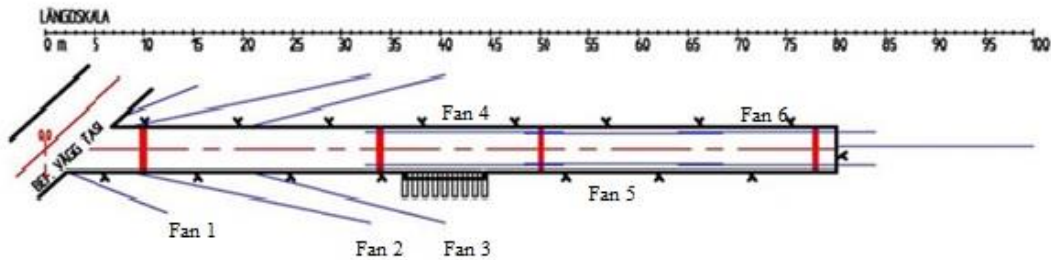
Plan view of the TASS tunnel with the pre-grouting layout. Fans 1-3 are outside the tunnel contour while fans 4-6 are inside the tunnel contour. Fans are labelled with blue lines (Funehag & Emmelin, 2011).
